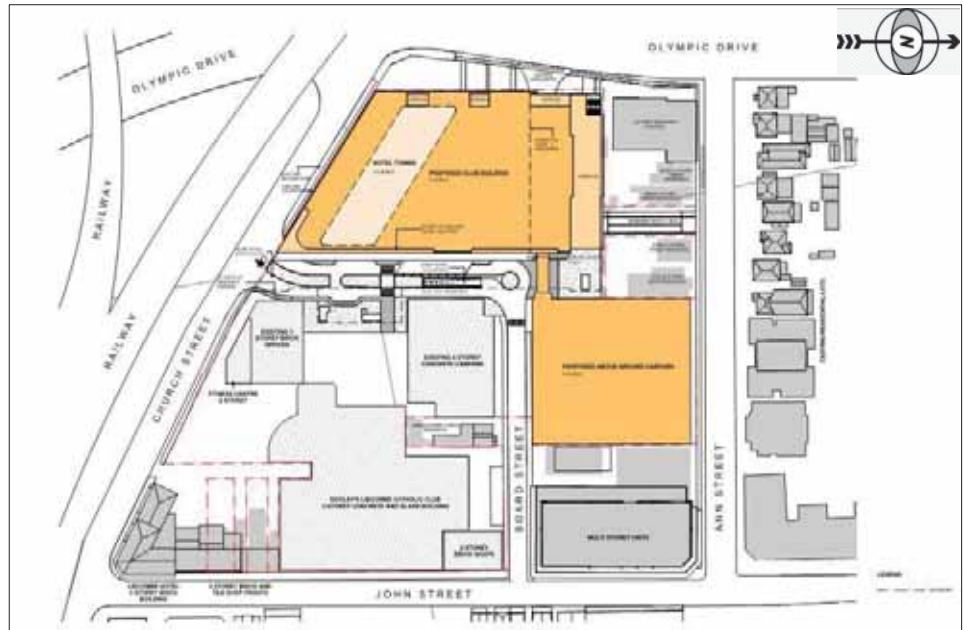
Architectural Site Plan (The Proposed Redevelopment for Dooley's Lidcombe Catholic Club)
